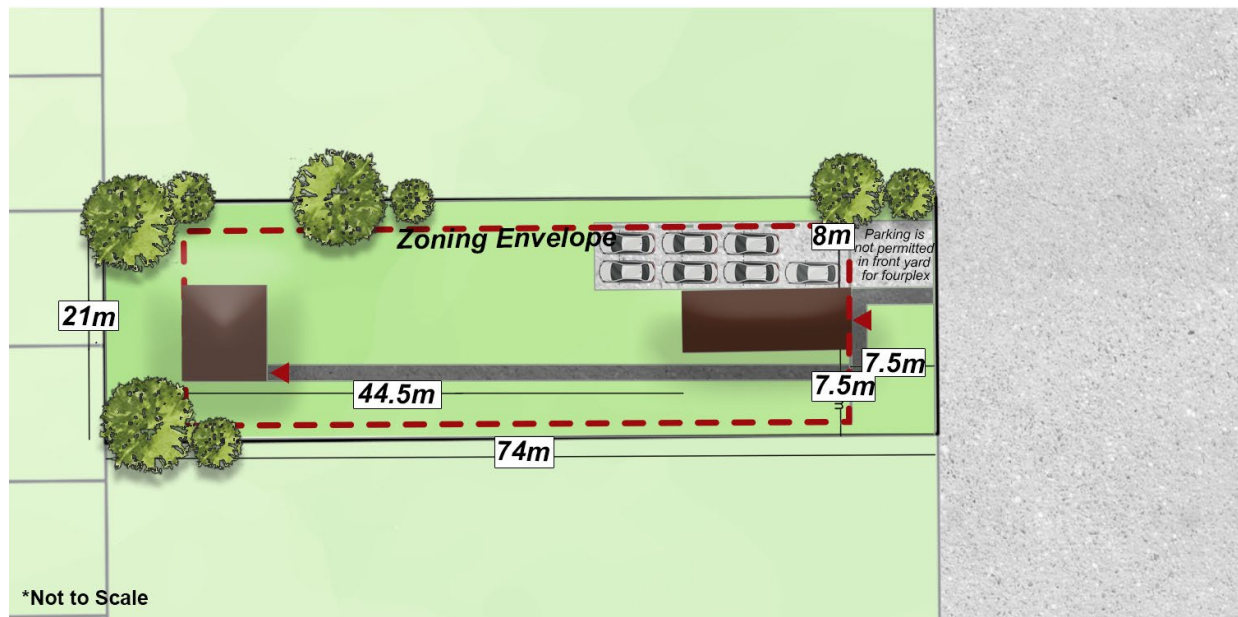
Fourplex Interior Lot with Frontage on Highway 48 Concept Plan
